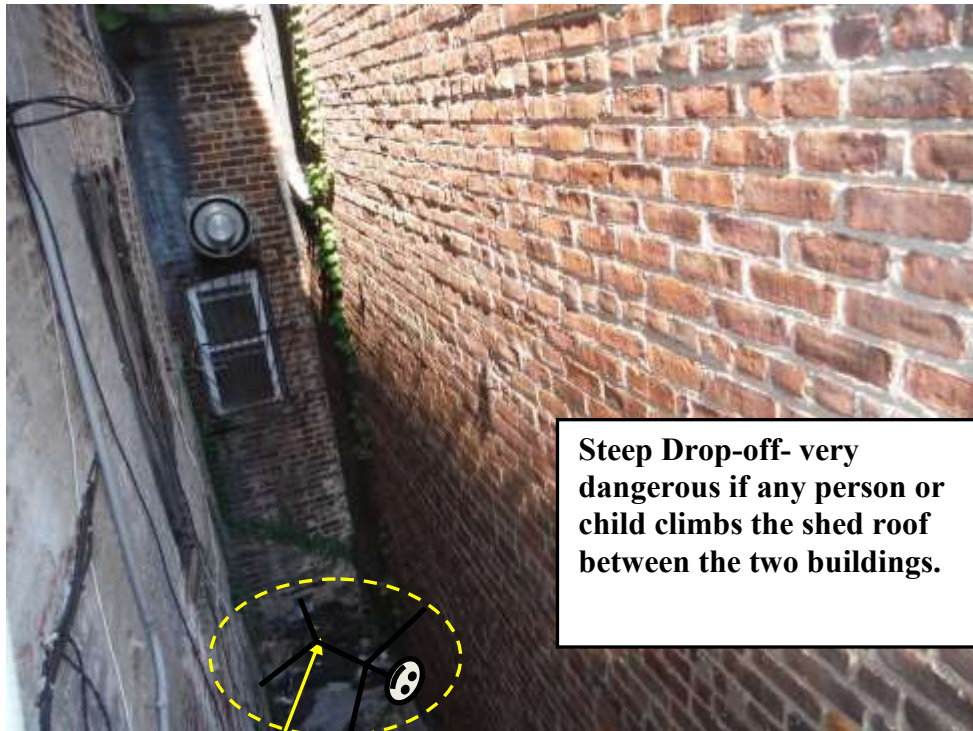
Steep drop-off as viewed on top of the shed roof between the two buildings; very dangerous!
